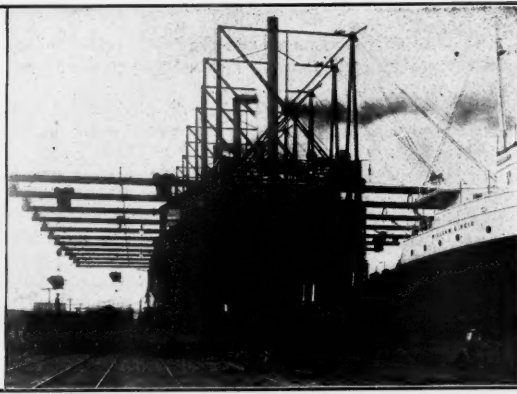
McMyler Direct Unloading Machine Showing Tracks.
